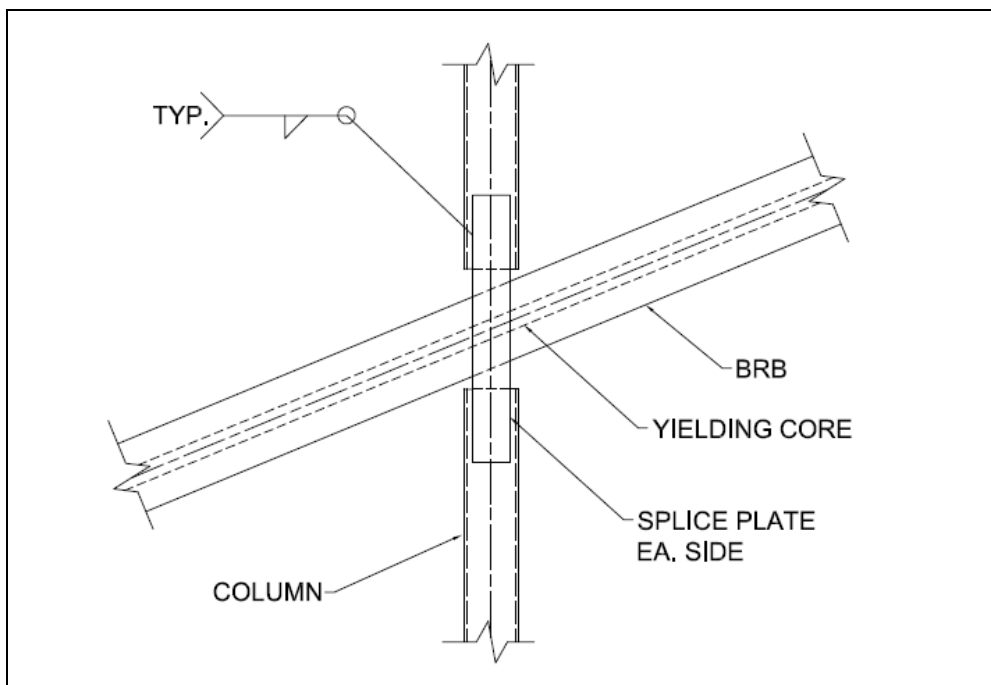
Column and BRB interface with Welded Connection
